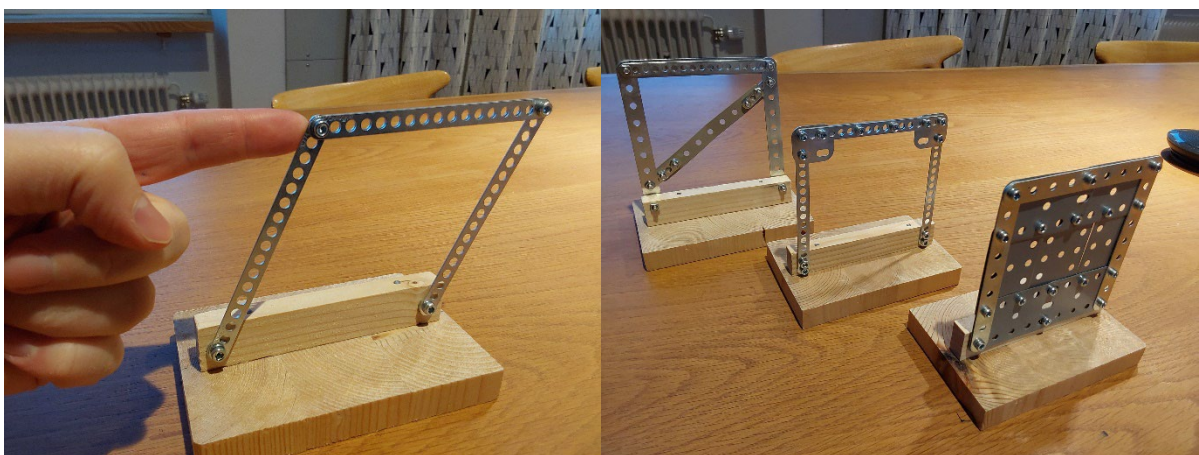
Custom built building frames (using wood and Meccano® elements) to illustrate the need for stabilizing as well as stabilizing concepts
